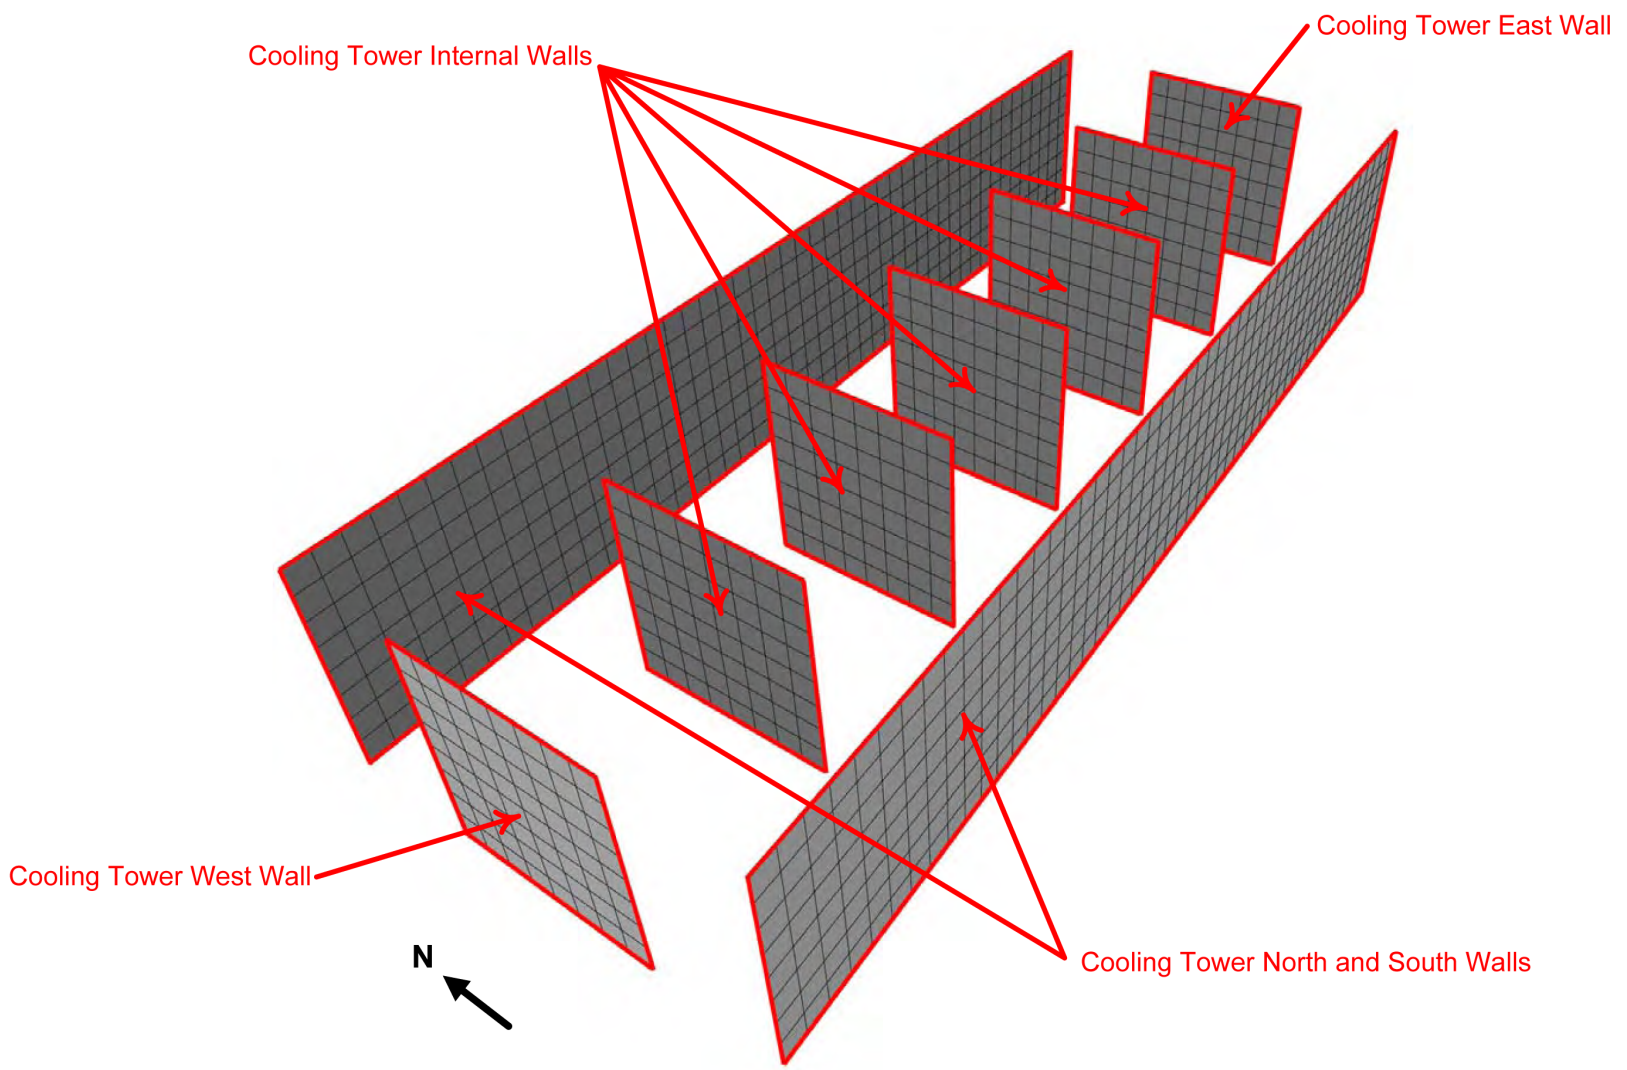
H.6-40C UHS Cooling Tower Wall Labeling Convention
